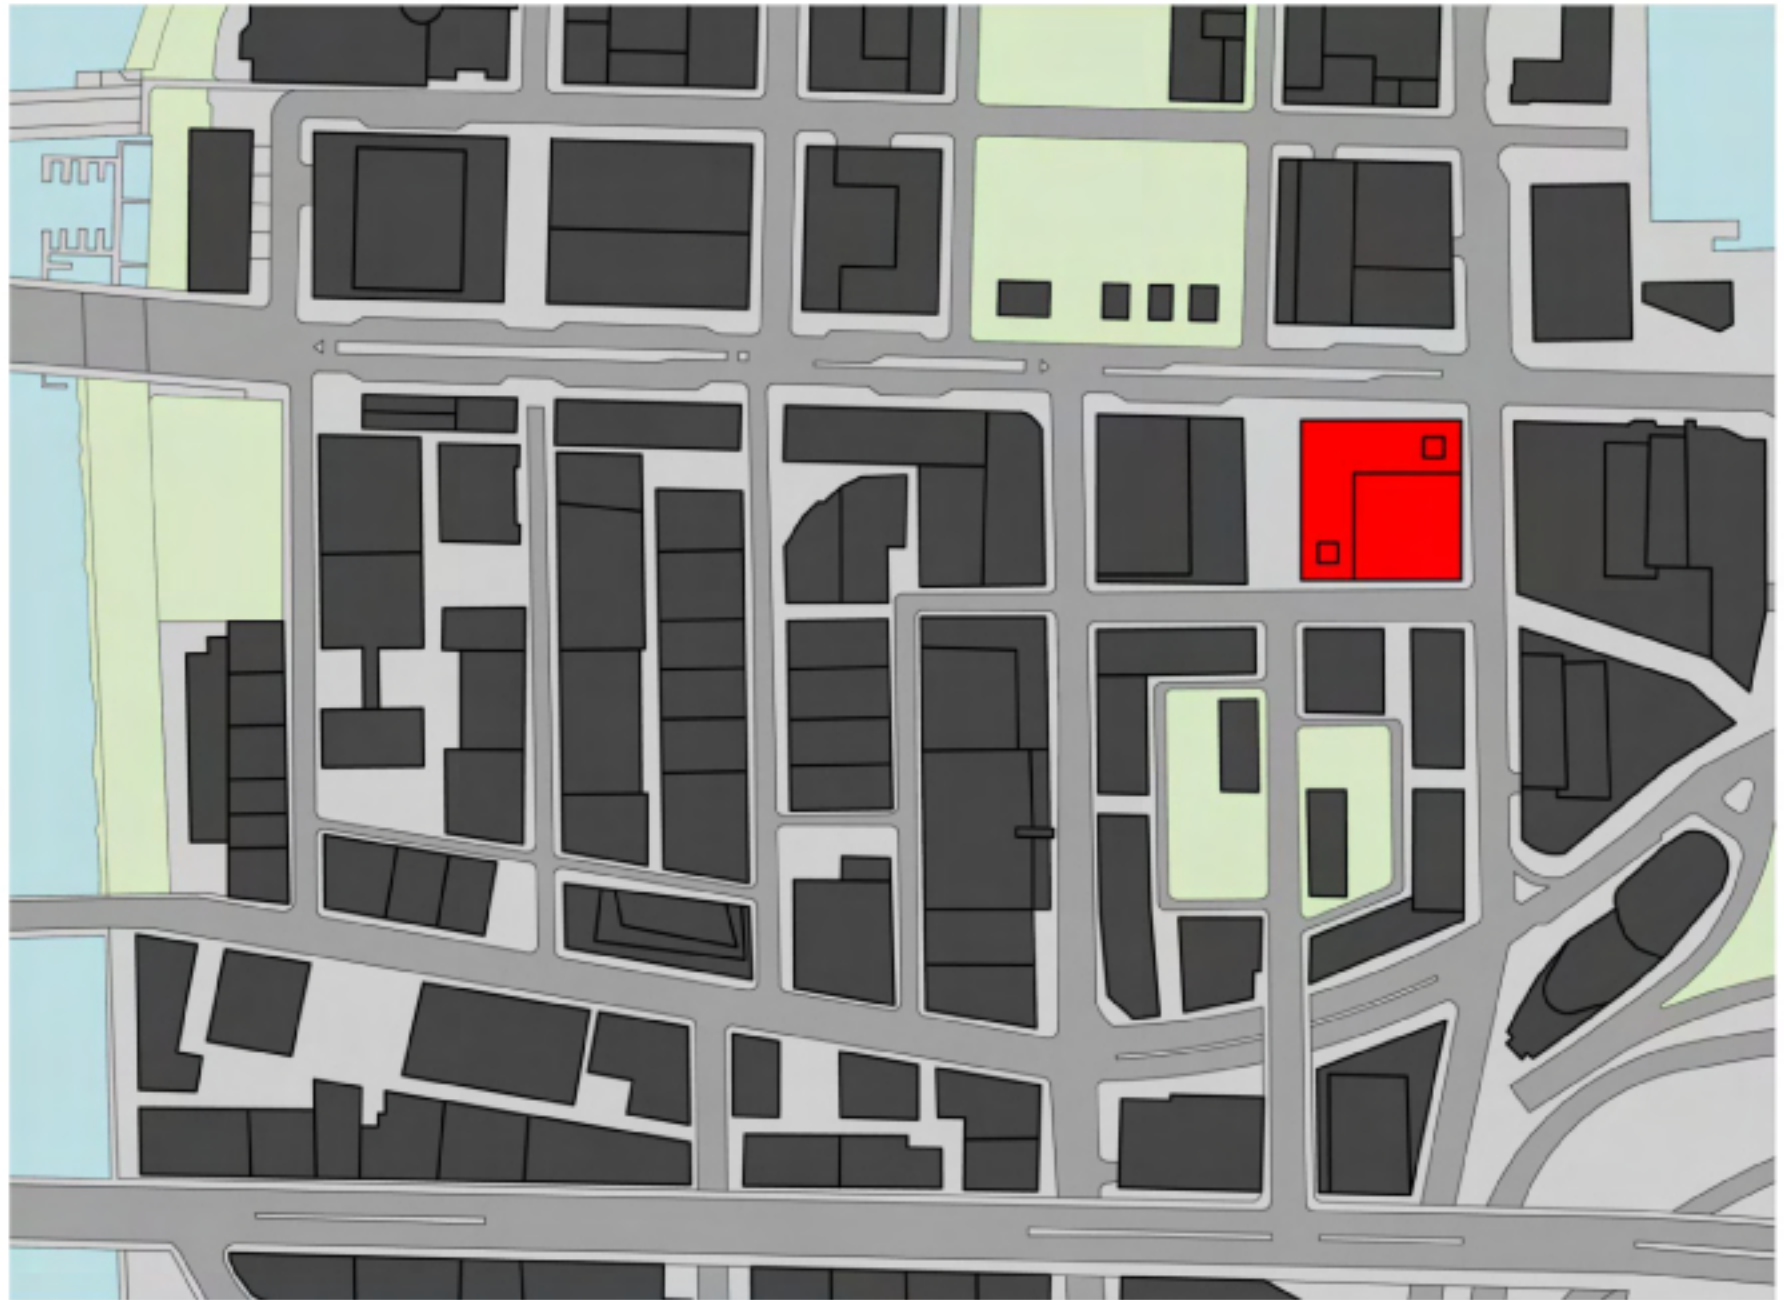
Site Plan which includes Seaport Development Plan [Created using AutoCAD]
